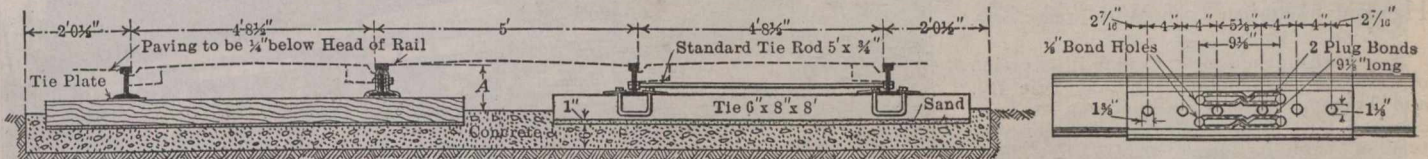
Cross Section of Track and Details of Bond Drilling.
